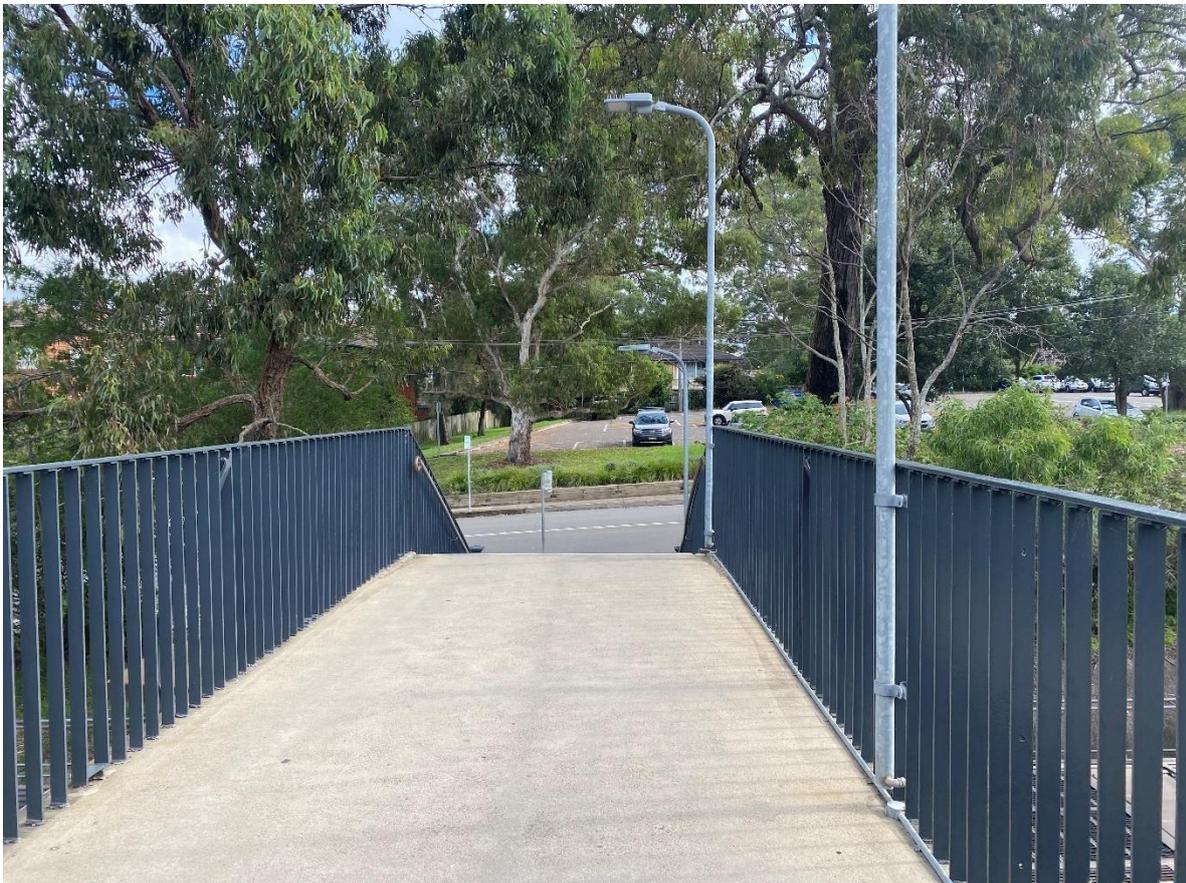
View towards commuter car park (construction compound area) on Culworth Avenue (AECOM, 2021)
